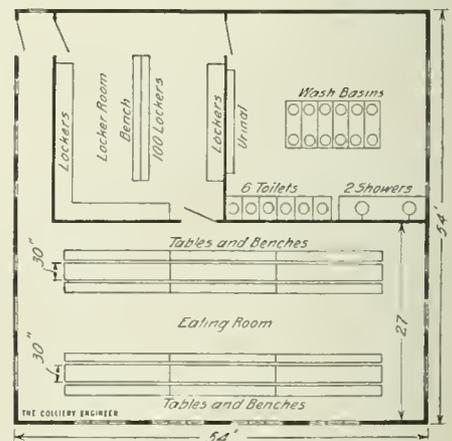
PLAN OF LUNCH HOUSE, PROSPECT COLLIERY
